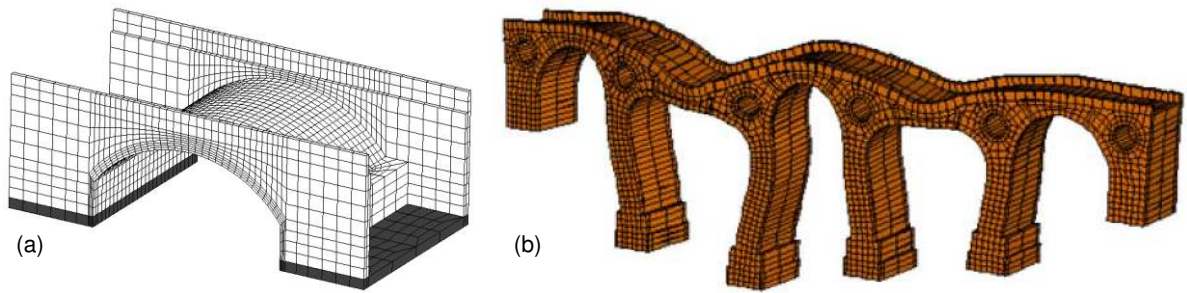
Modelling of masonry arch bridges with 3D finite elements proposed by Garrity and Toropova in 2001 (a) and by Milani and Lourenço in 2012 (b)
